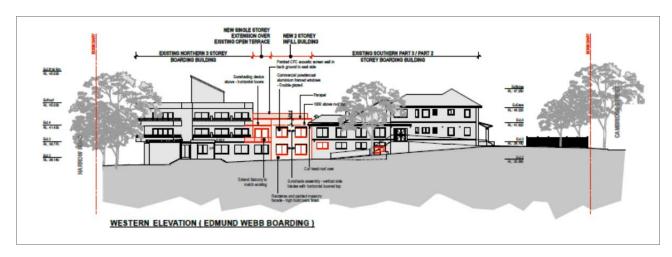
Proposed Western (Side) Elevation of Edmund Webb Boarding Facility
